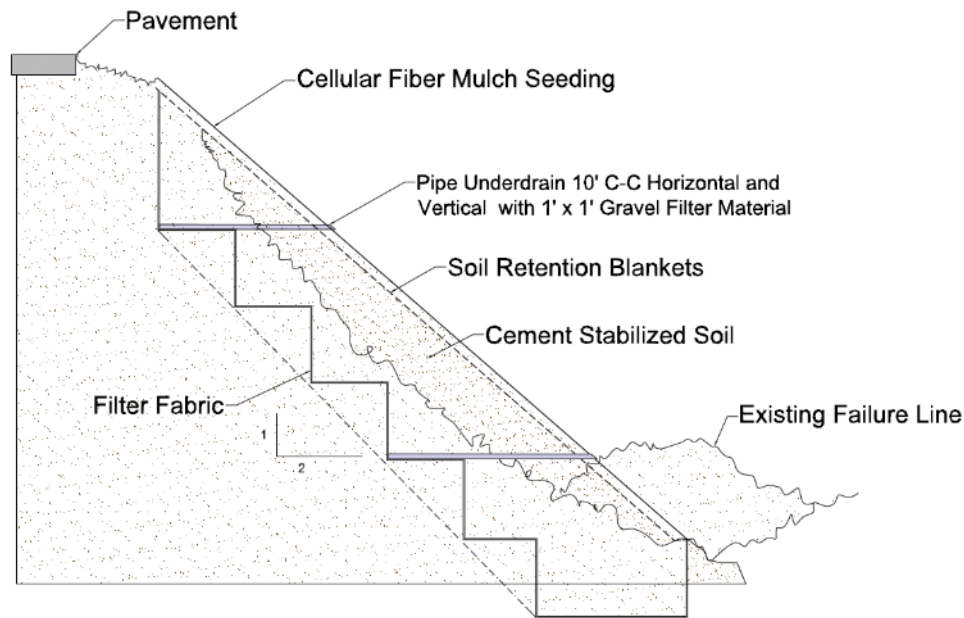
Slope repair using benching, filter fabric, cement stabilization, cellular fiber mulch seeding, soil retention blankets, and an underdrain pipe system
